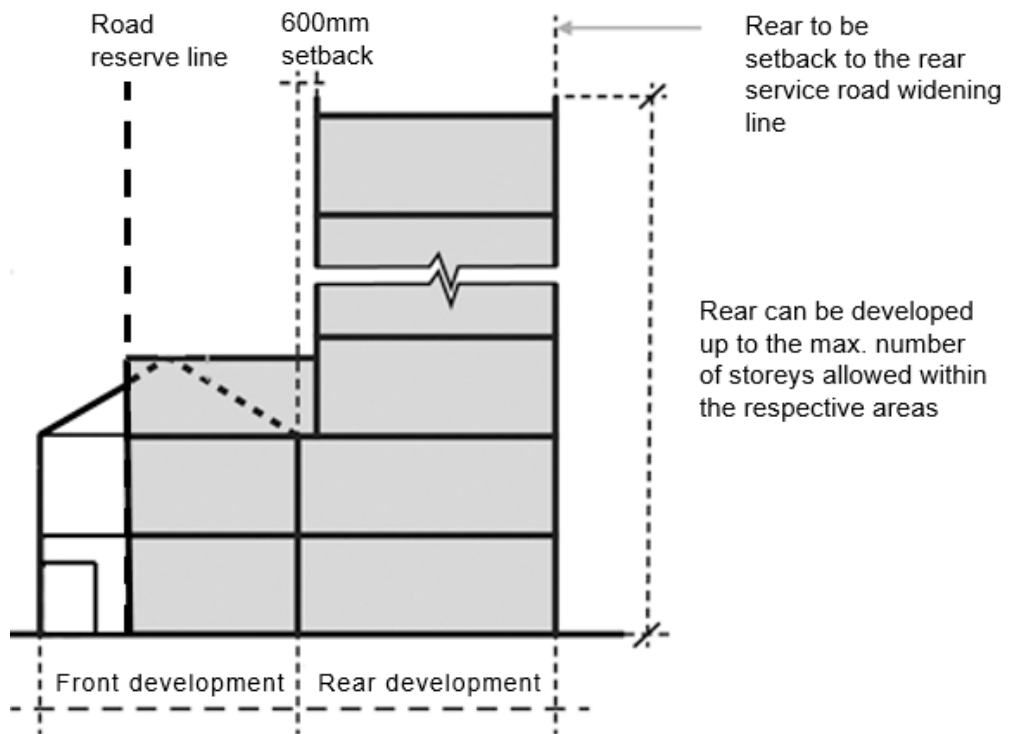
Type 2 Infill Site built up to Road Reserve Line
